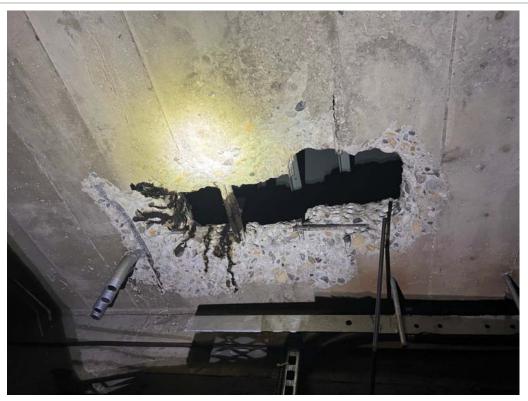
Main Floor – Typical Hole in Floor. Requires Removal of Corroded Steel to Infill
